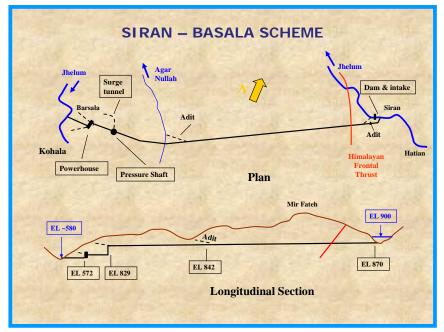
Location of Dam site (Siran-Barsala) and Power house
